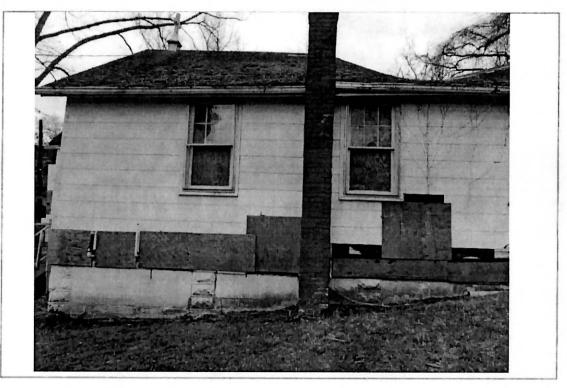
View of church structure (looking southwest) Detail:\_\_\_\_\
